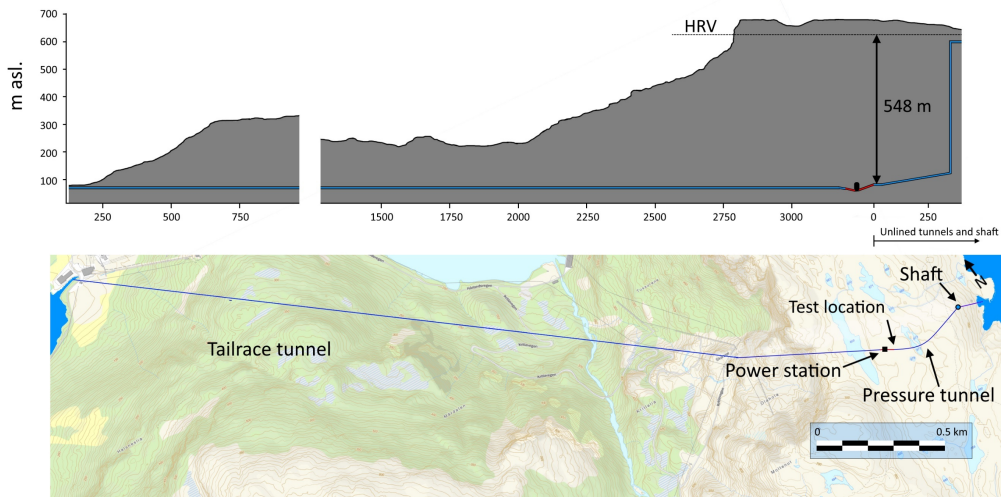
Løkjelsvatn HPP; longitudinal section (top) and plan view (bottom). The longitudinal section has been shortened to enhance the legibility. Note that plan view and long section have different scales. Background map after NVE (2020)
